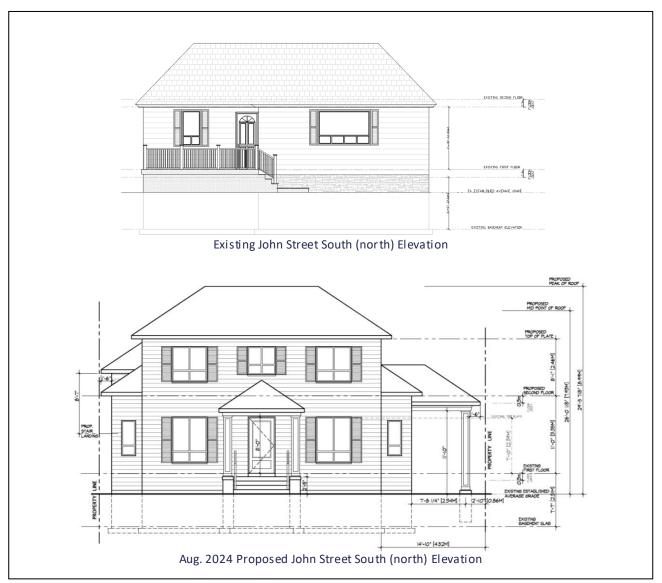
Existing elevation and original design concept (Blue Grove Engineering Group Inc., Aug. 2024)
